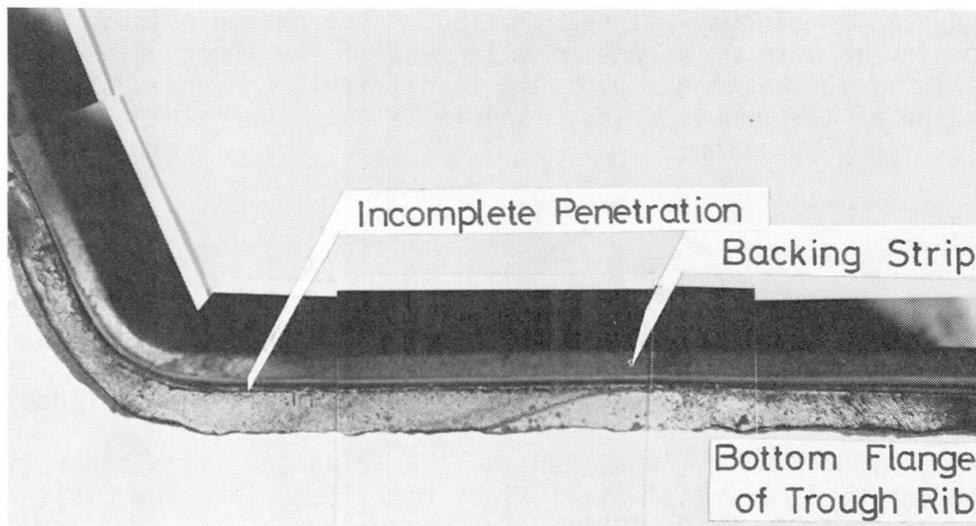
Typical fatigue fracture surface of trough rib joints.
